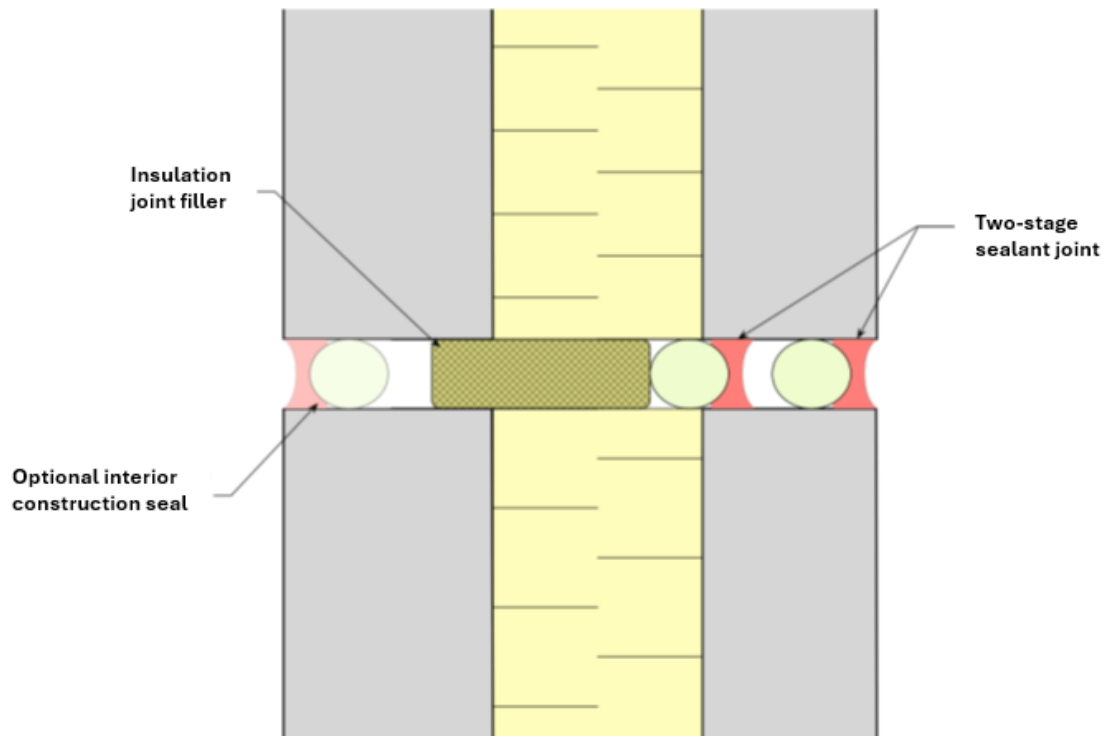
Example of a well-insulated joint detail in a double wythe insulated precast wall panel
